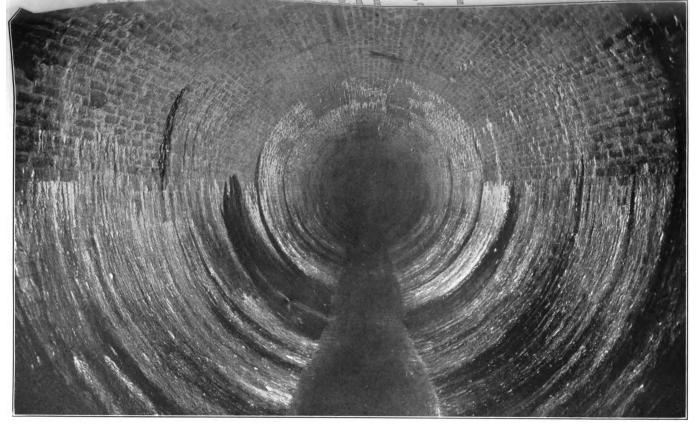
Lining of Tunnel under Shaft No. 7.
